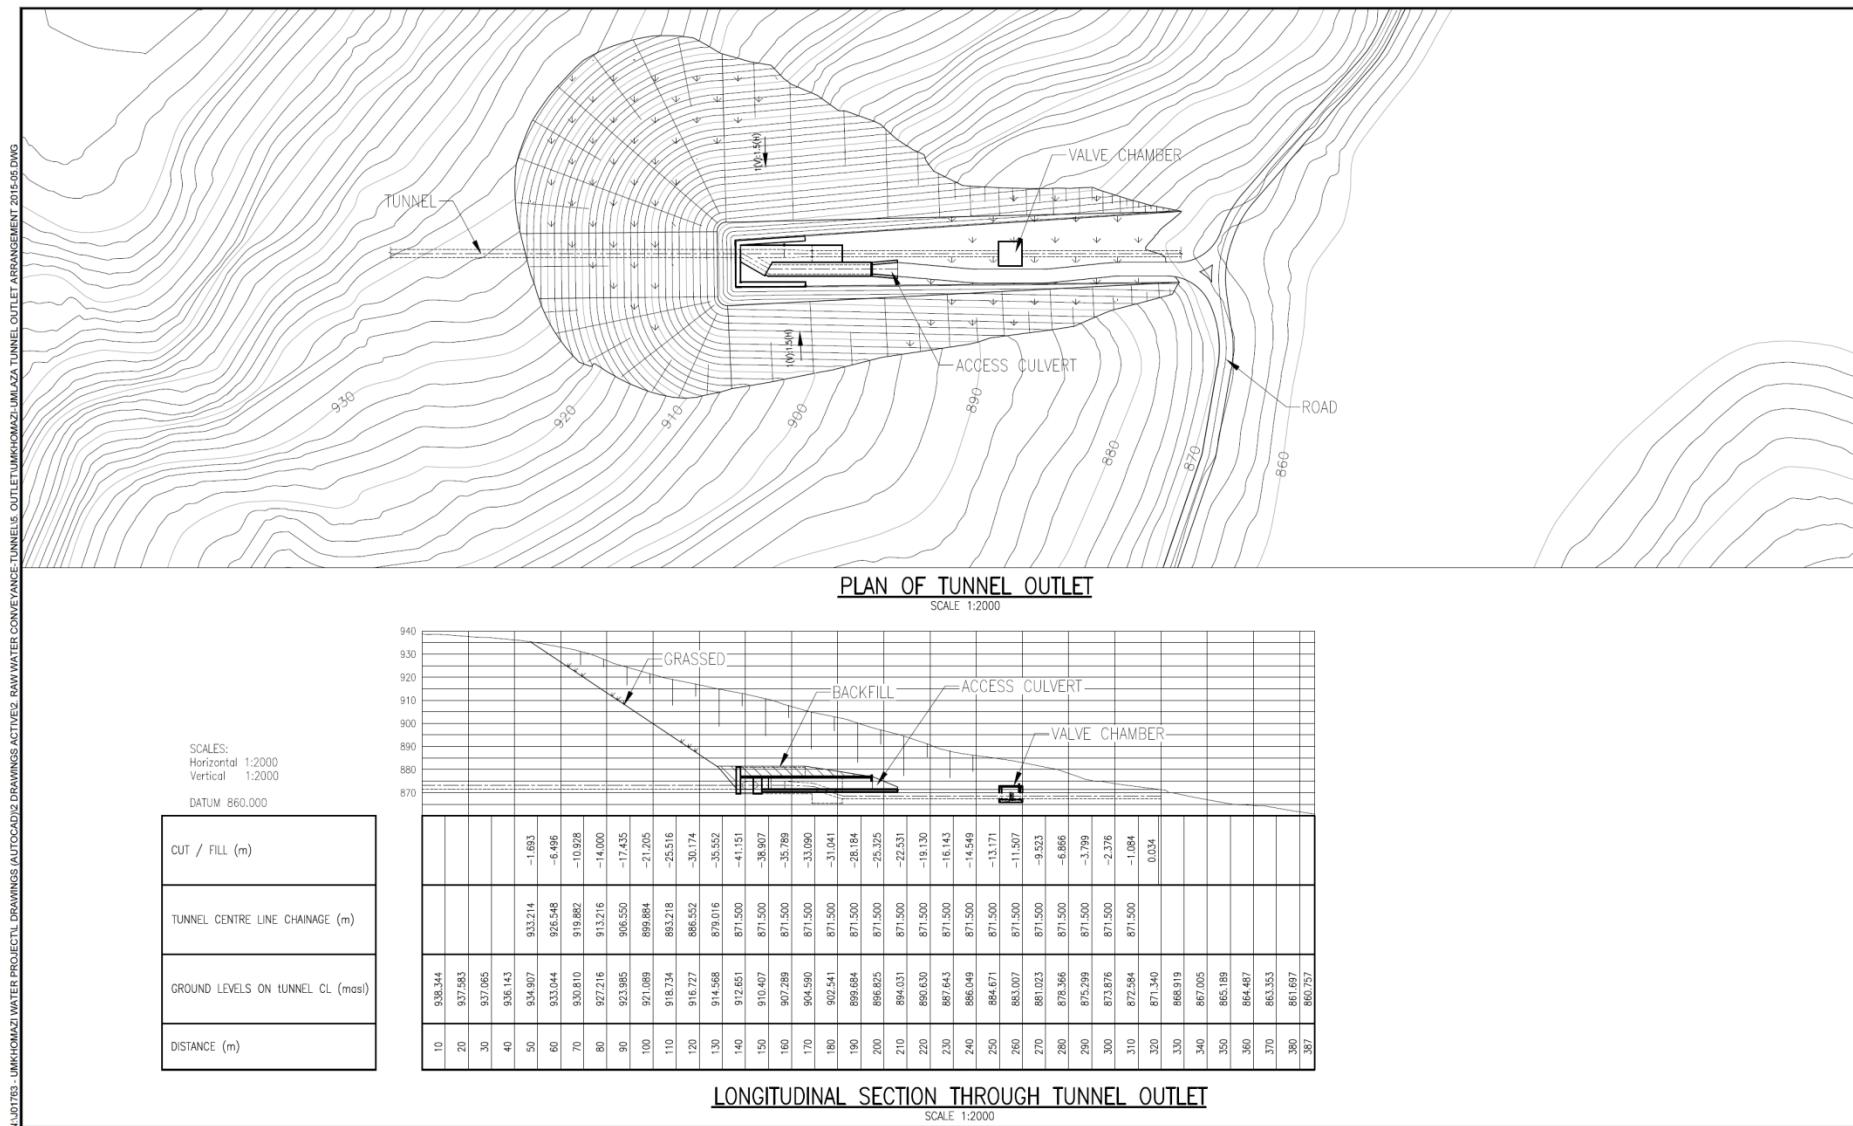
G.1: Tunnel Outlet Portal Excavation and Access Arrangements
